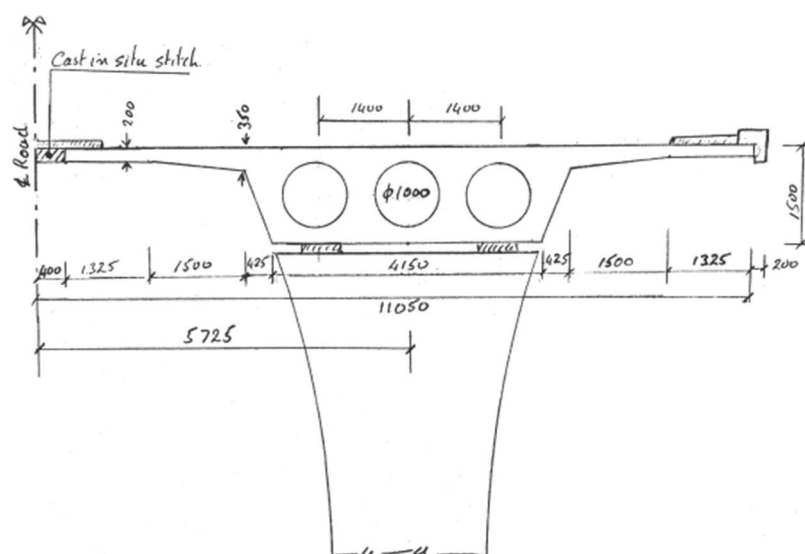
Voided ribbed slab deck (Source: Robert Benaim, [19].).
